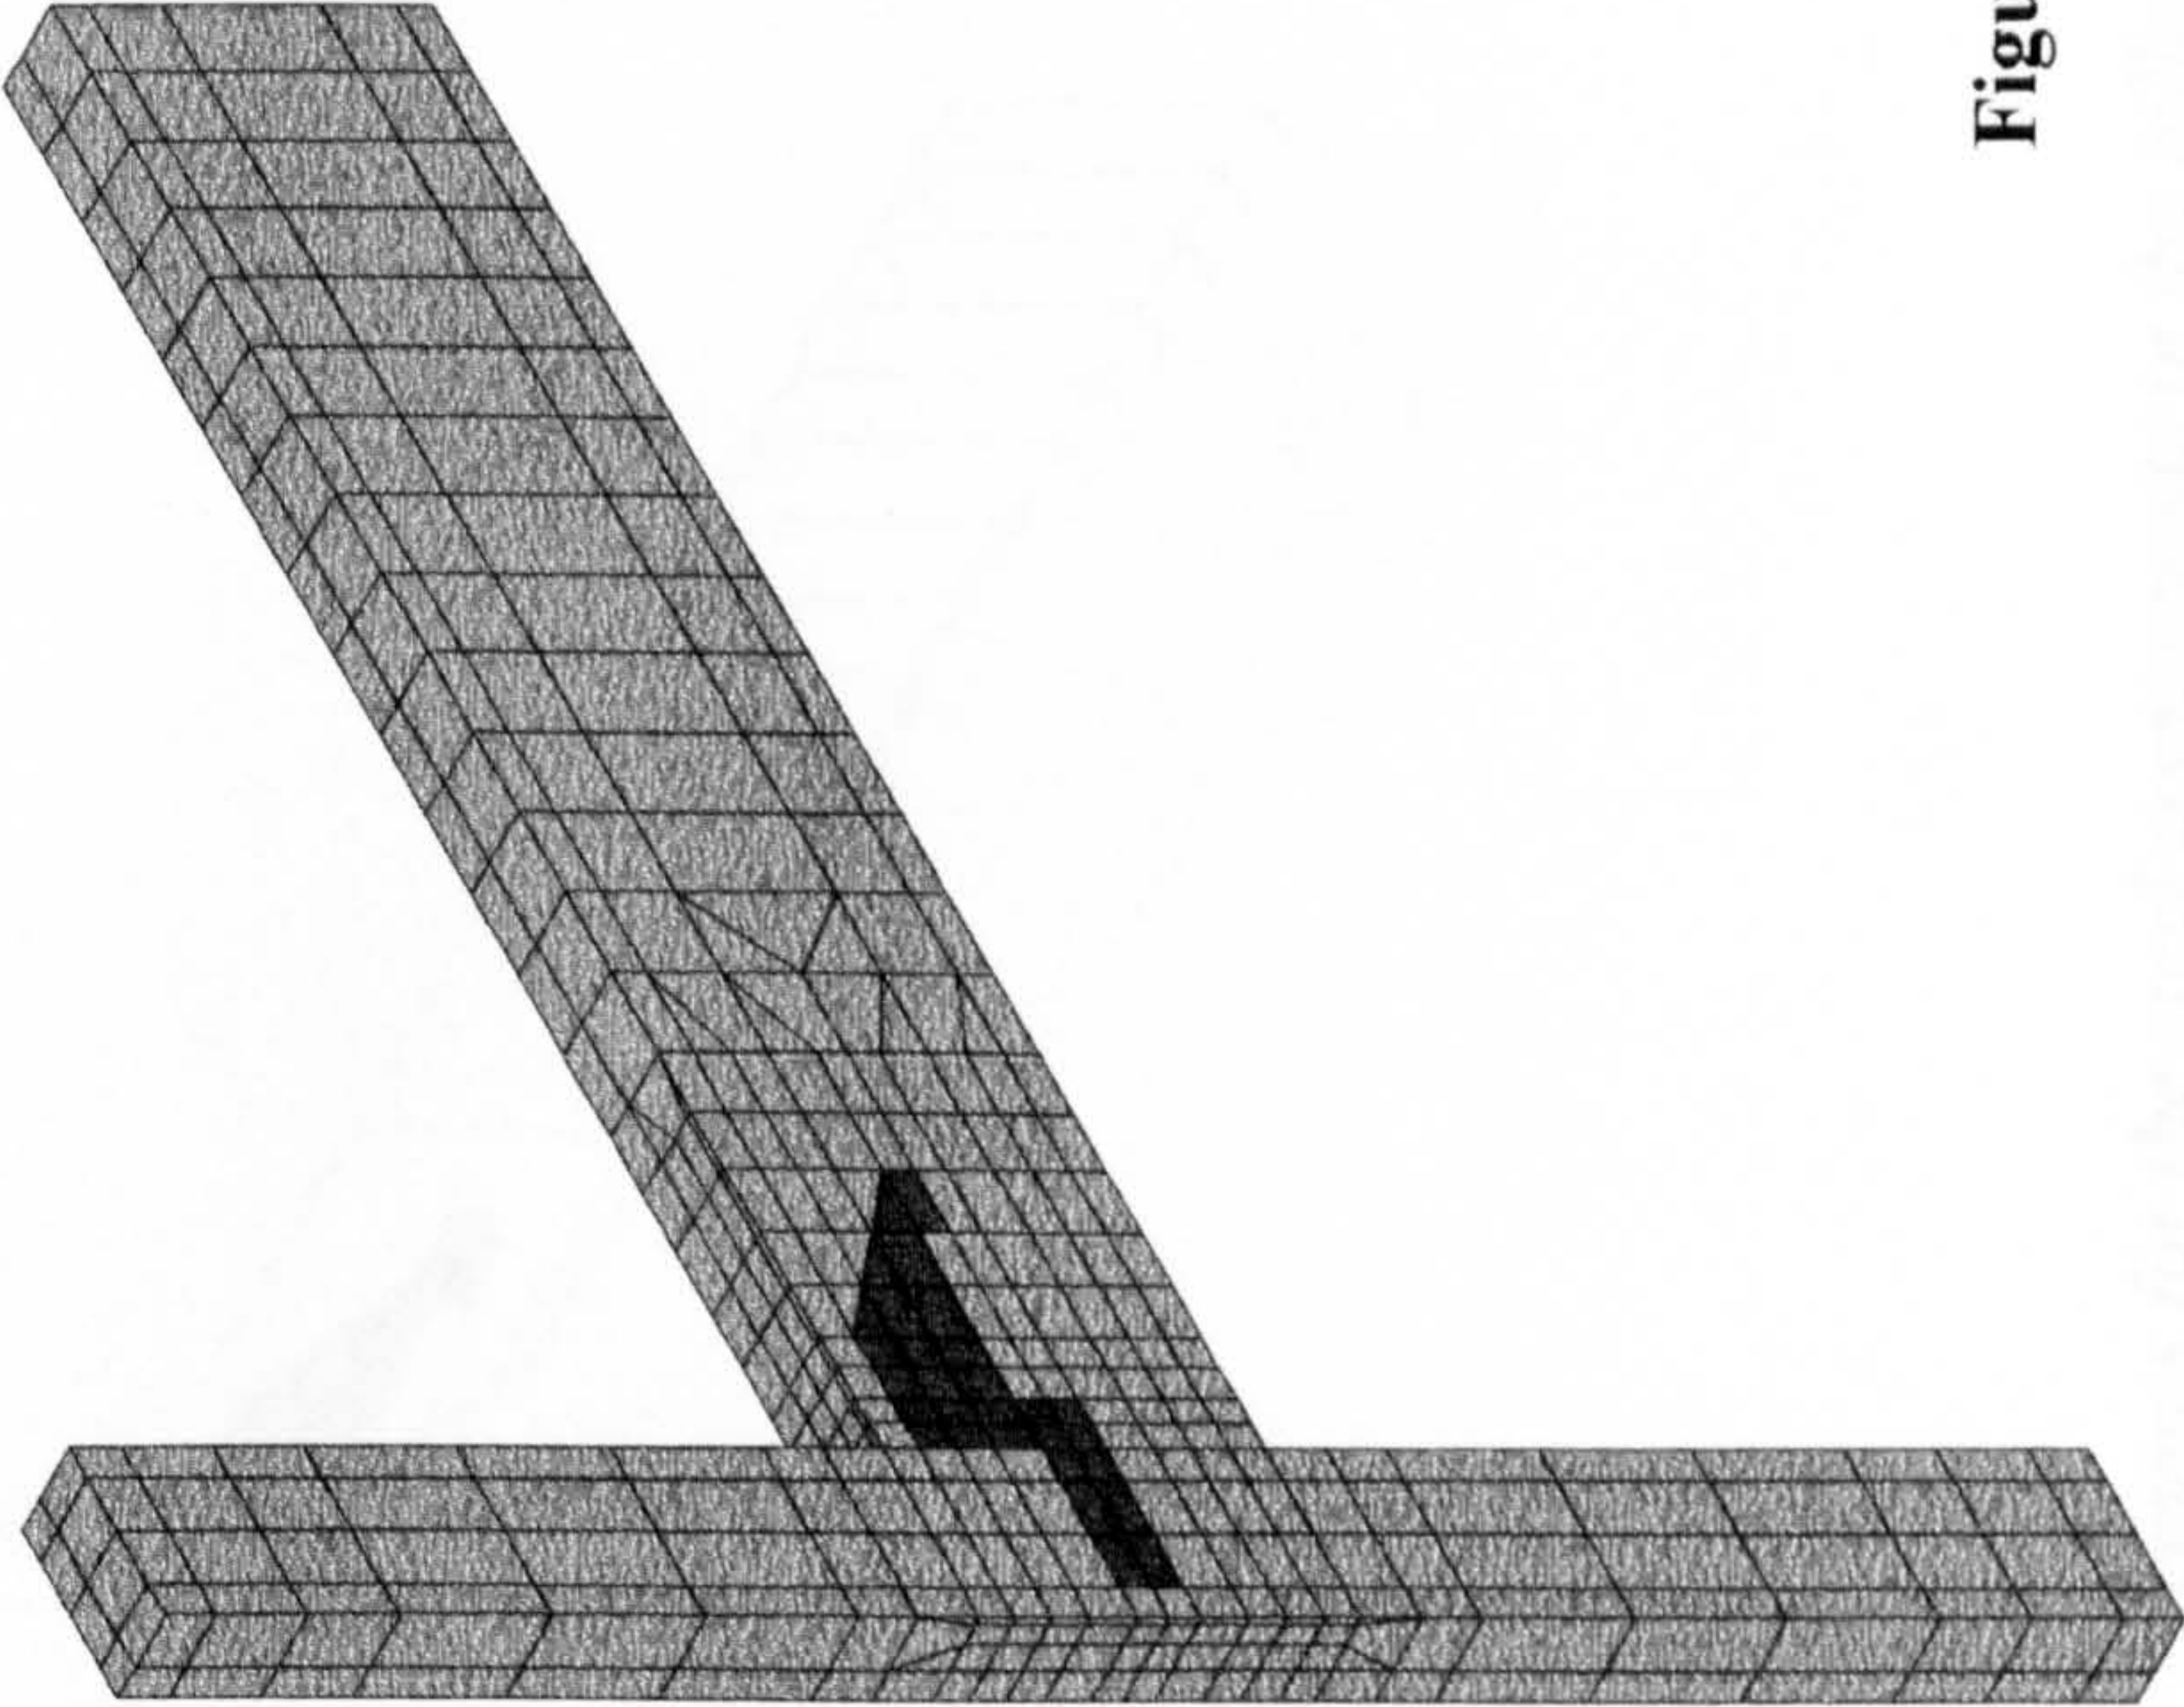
(b) Elements for the steel components in the billet-welded plate joints TW1 and TW2
